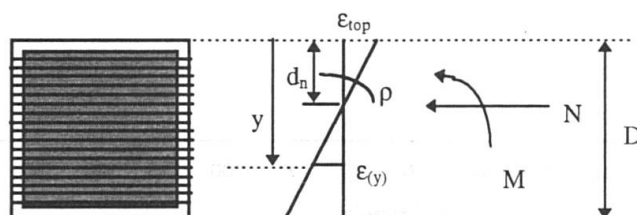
Concrete Filled Box Section Typical Strain Distribution
